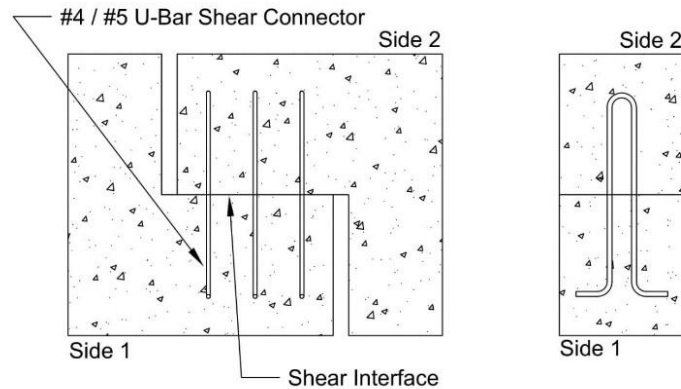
Simplified elevation schematic of push-off test specimen containing 3 U-bars to show side 2 (top), side 1 (bottom), reinforcing steel bars, and shear interface.
